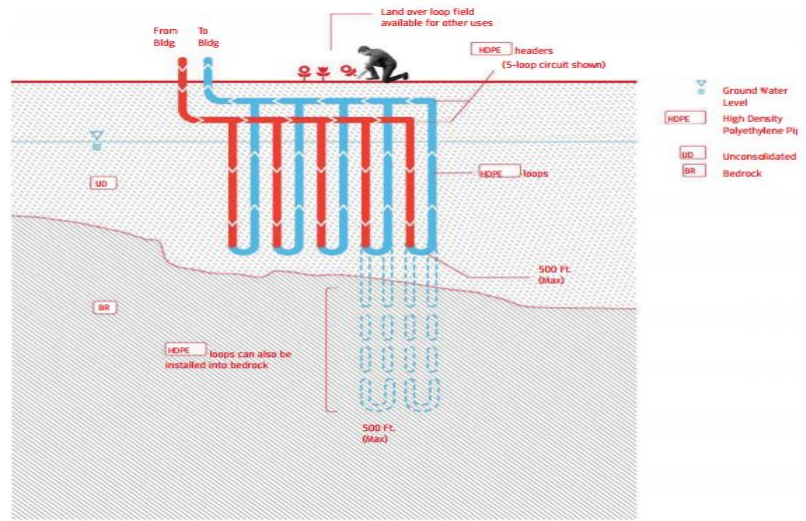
(above): Geothermal heating and cooling – Closed Loop System¹⁵
